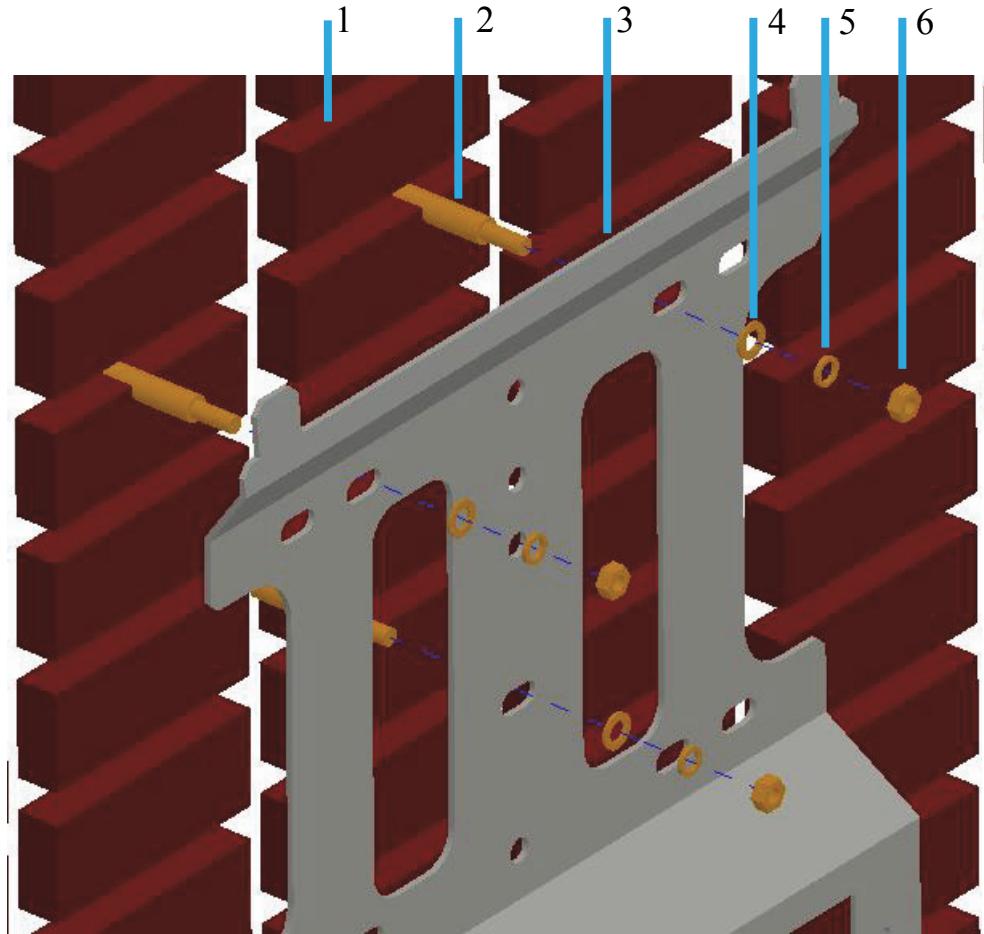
Fasten the Bracket against Masonry Wall with Expansion Screws
